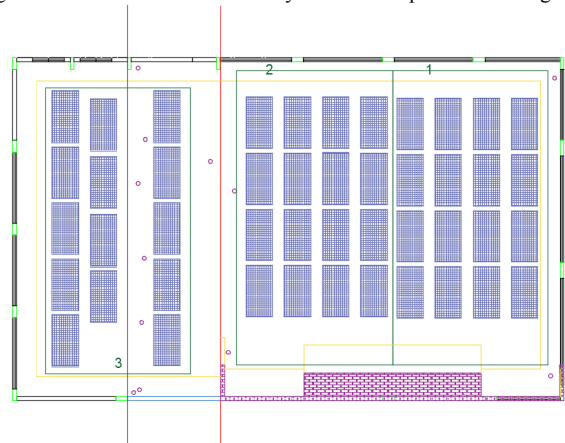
Top View of the Expanded Building with proposed PV System Layout
